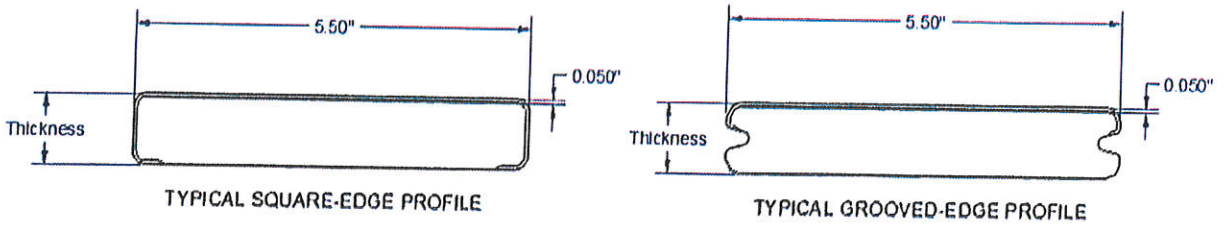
TYPICAL TREX® DECK BOARD PROFILES
